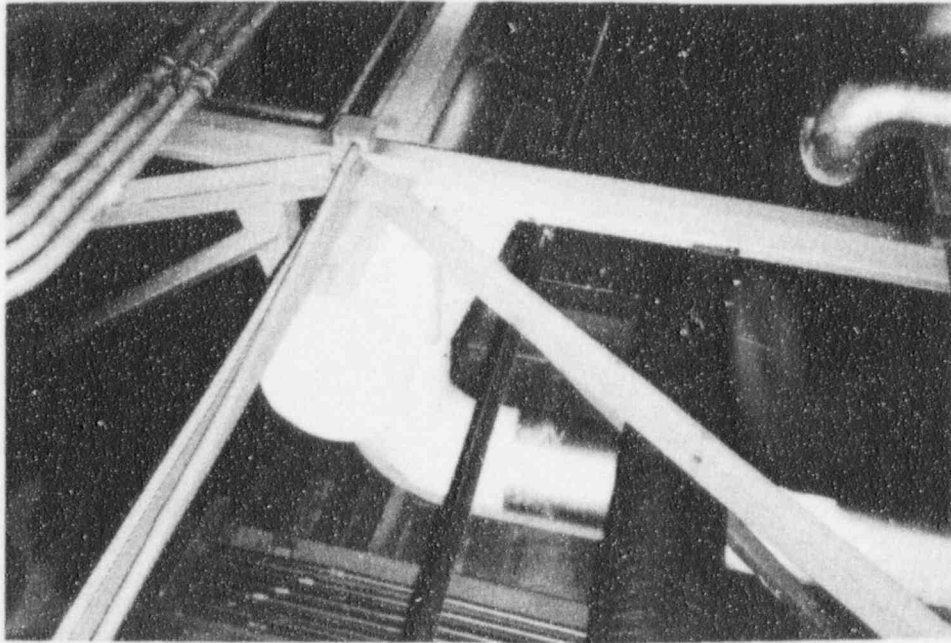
Guide Support for Large Bore Hot Line in Glendale Unit 2
